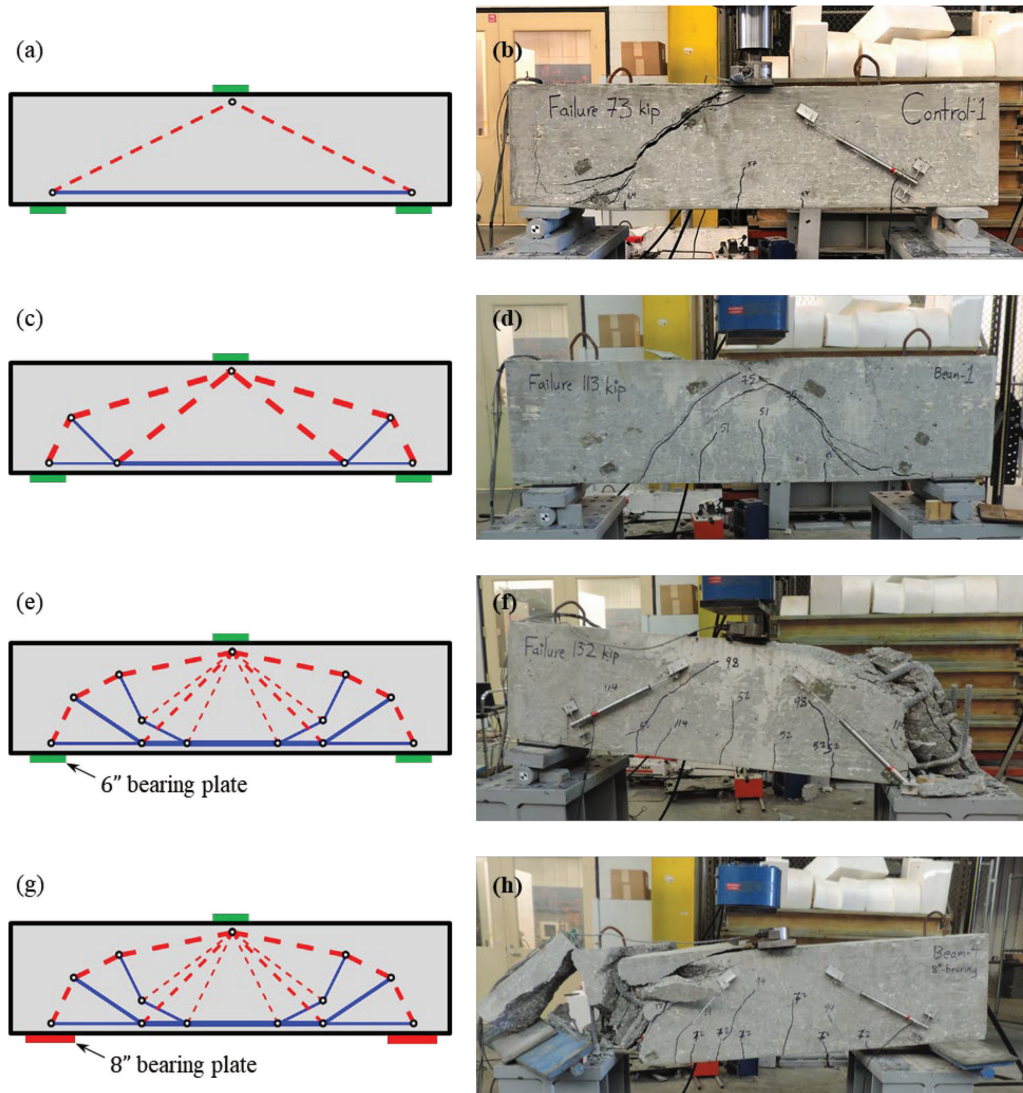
Failure modes of deep beams considering standard ACI layout with 6 in. (0.15 m) bearing plate, optimized layout I with 6 in. bearing plate, optimized layout II with 6 in. bearing plate, and optimized layout II with 8 in. (0.20 m) bearing plate, respectively.
